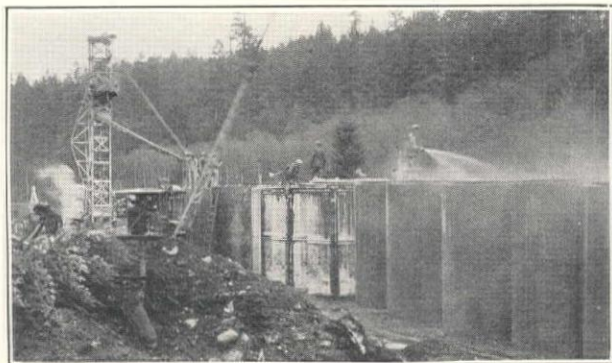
Molding and Curing Sections of 96-in. Diam. Reinforced Concrete Pipe for Lake Youngs Aqueduct, Seattle
